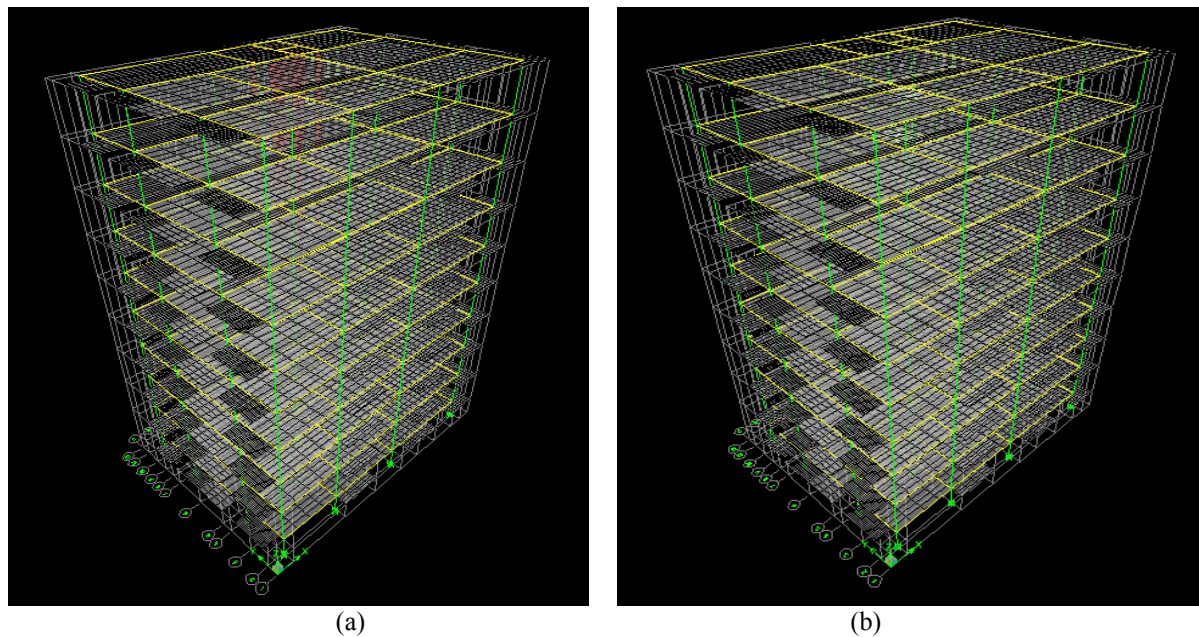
3D Model at FE scheme (a) shear wall at lift-core (Model A), (b) only column at lift-core (Model B)
